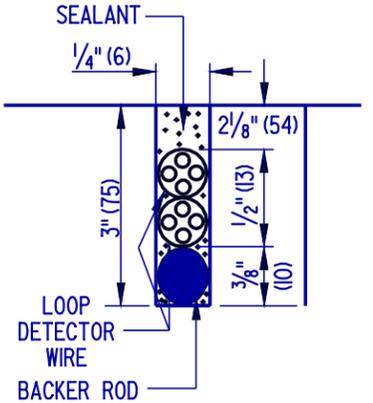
DETAILS FOR INSTALLING LOOP DETECTOR WIRE (SINGLE WRAP)
